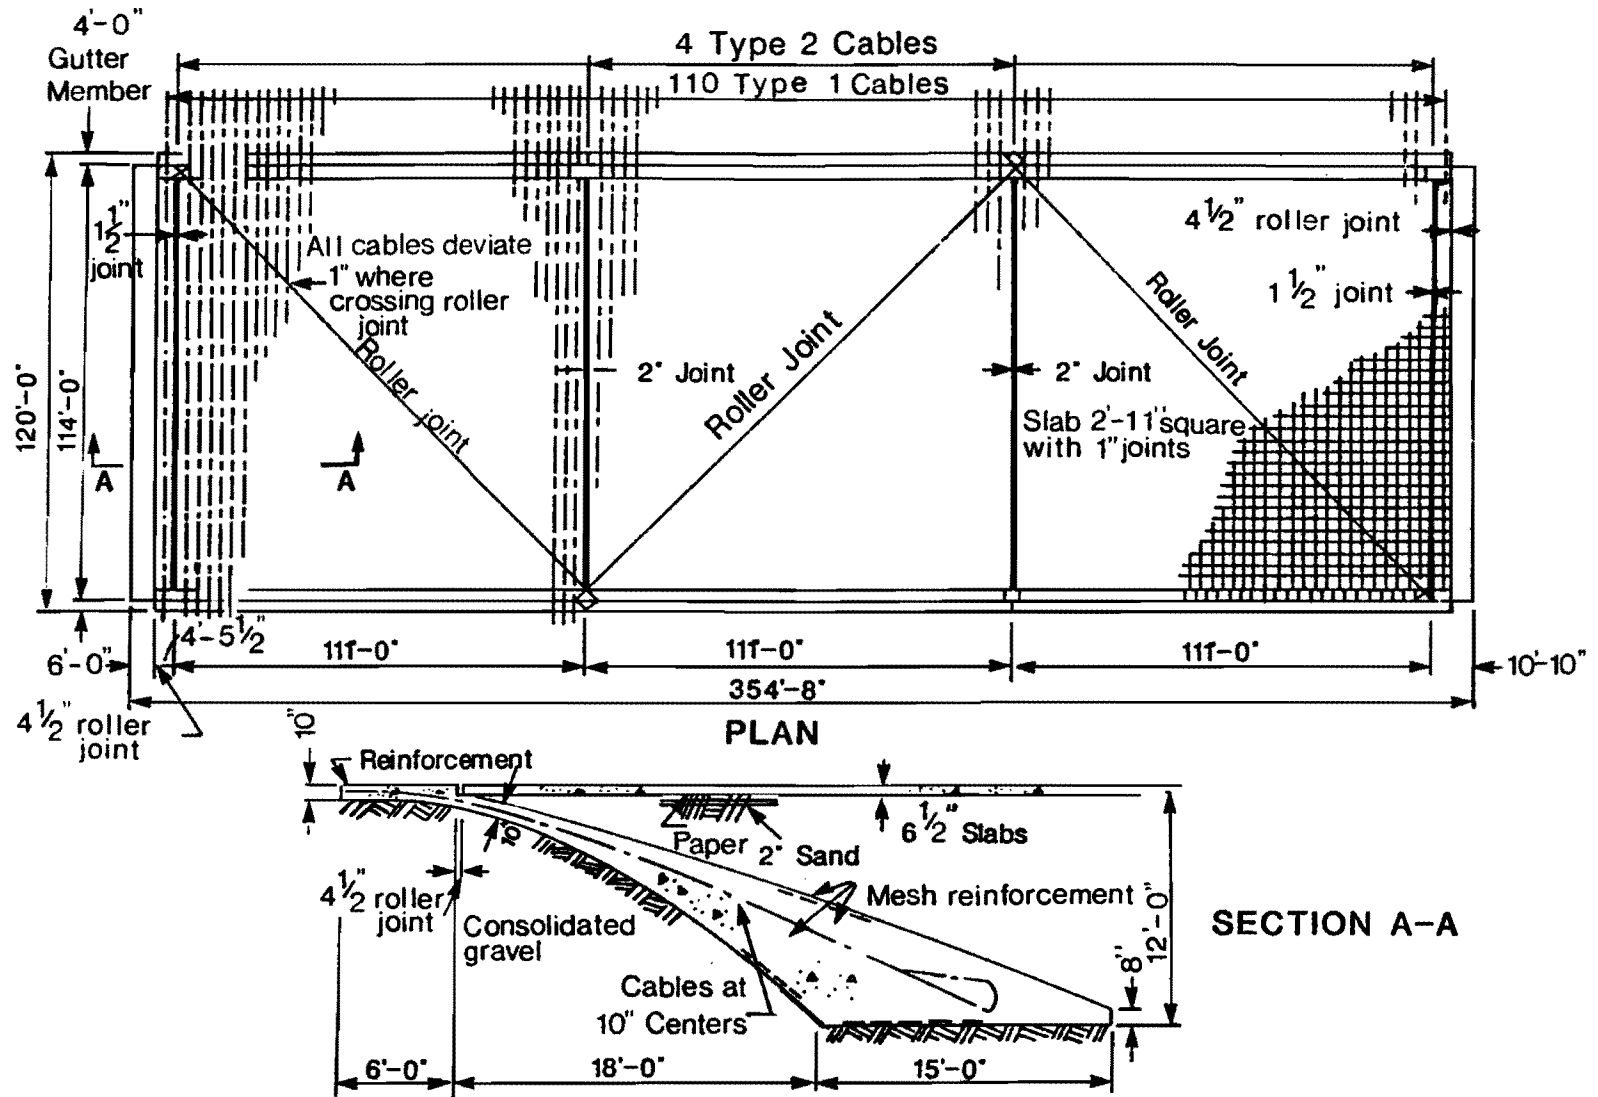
Layout of slabs at Orly Runway, France (Ref 56).
